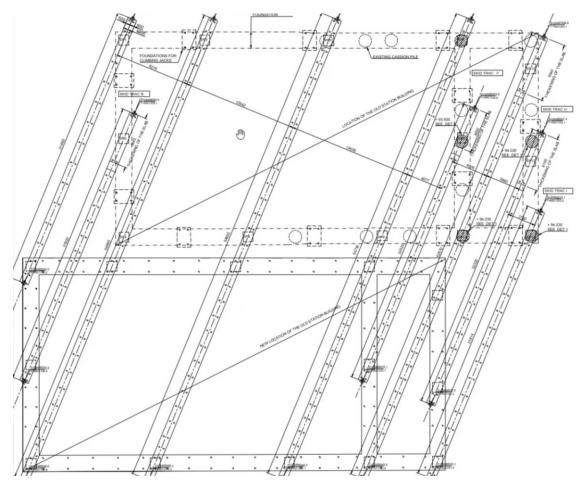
Plan view of the original location (dashed lines), the new location (full lines) and the track beams
